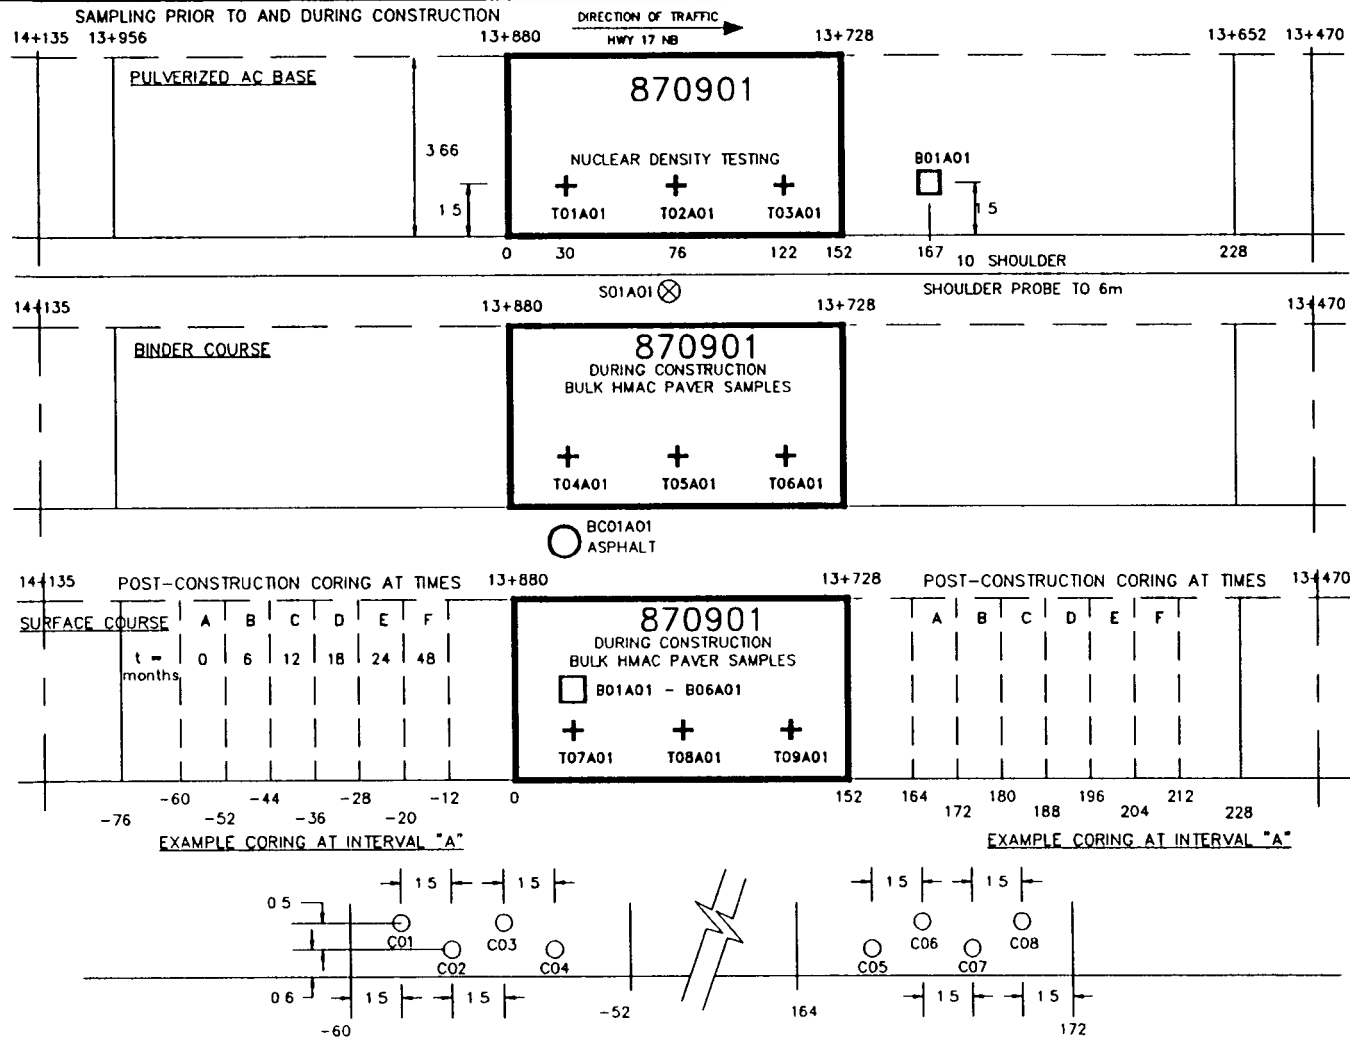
MTO ON. SPS-9A, HWY. 17 WB, PETAWAWA, ON.-TEST SECTION LAYOUT
